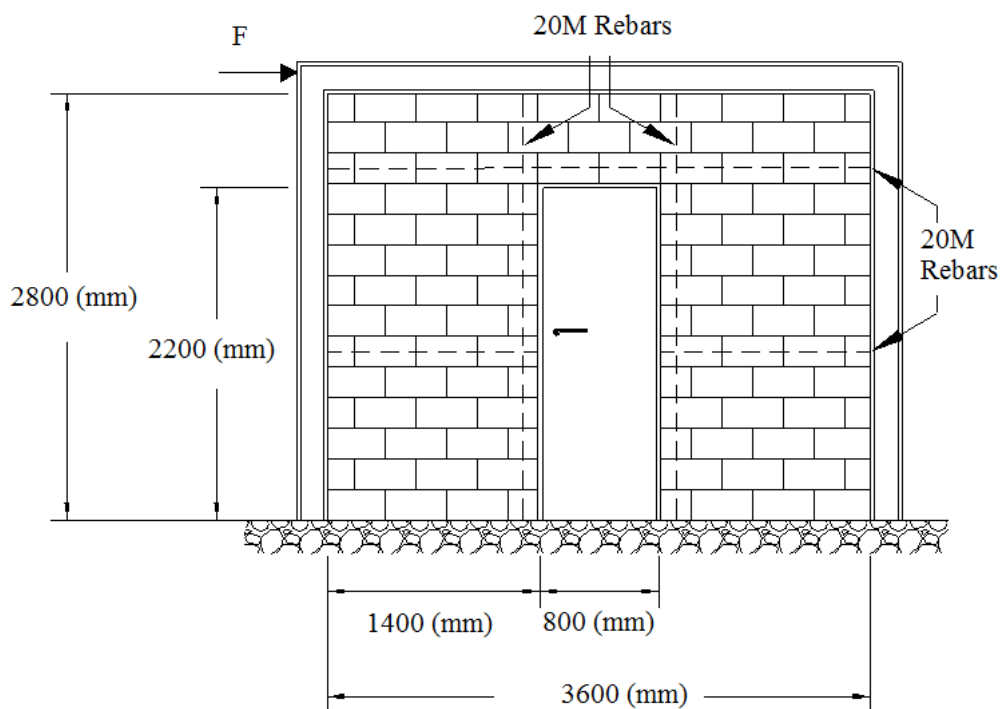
15. Reinforced Infill Wall Case With Central Opening in Reinforced Infill Walls (NTS)
